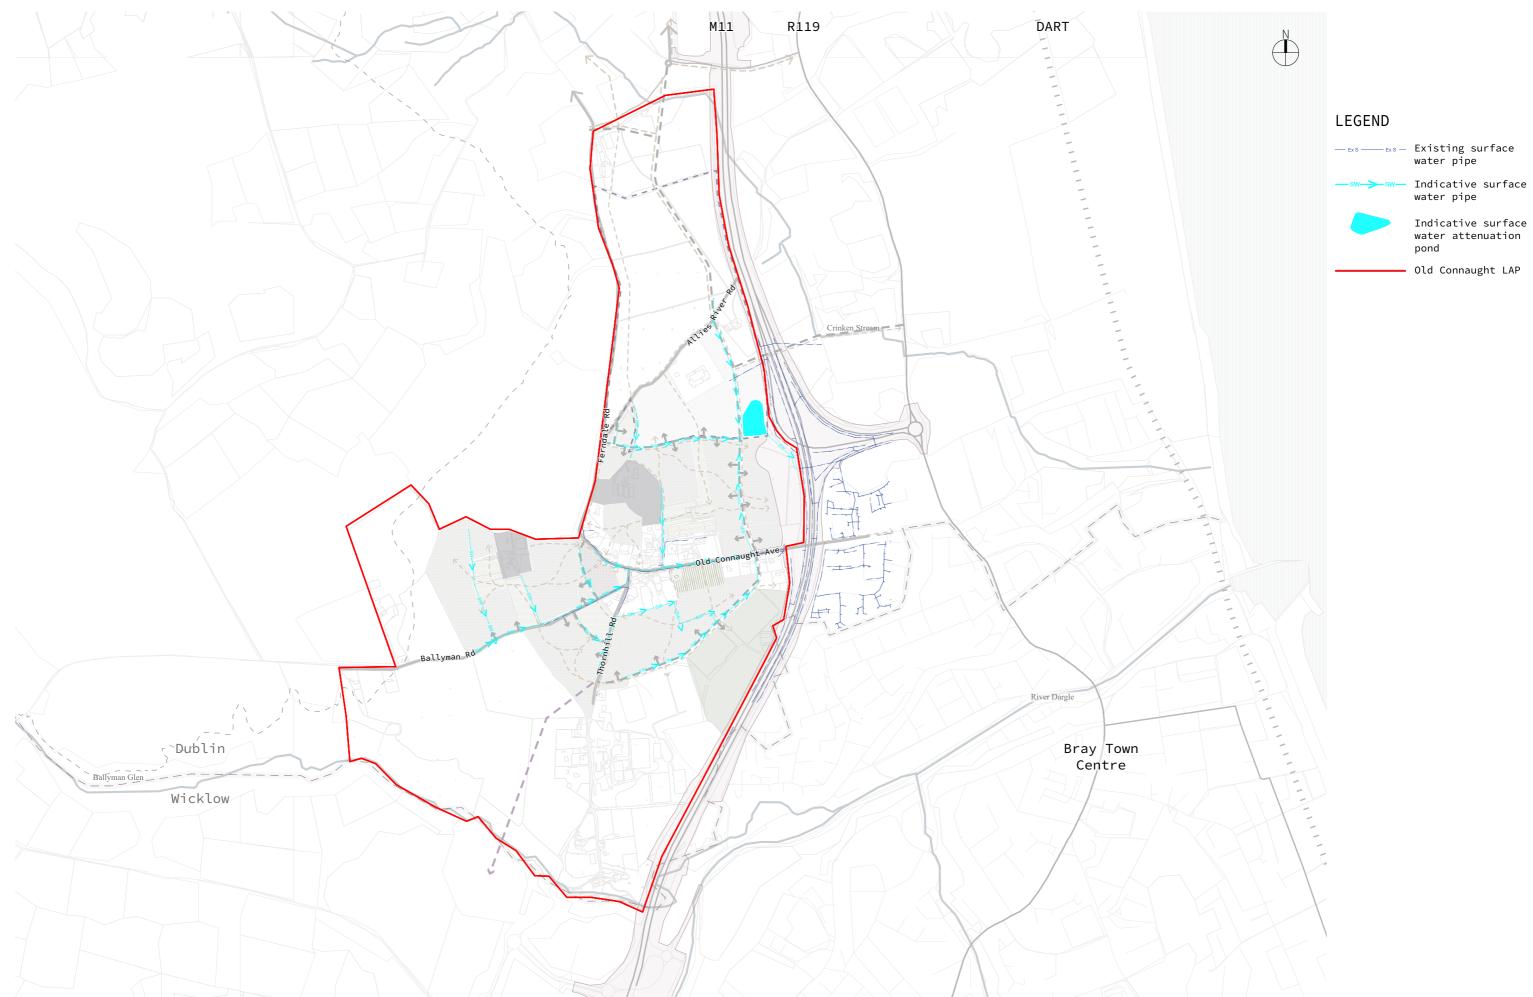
Preferred Stormwater Drainage Strategy – Old Connaught
